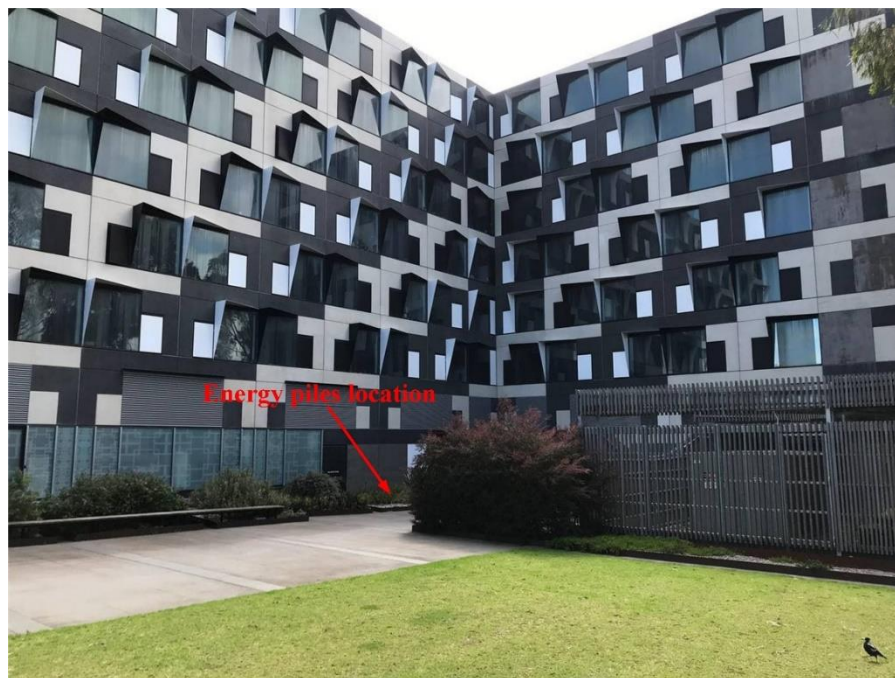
The student residential building beneath which the new energy piles were installed (Logan Hall, Monash University, 2021).
